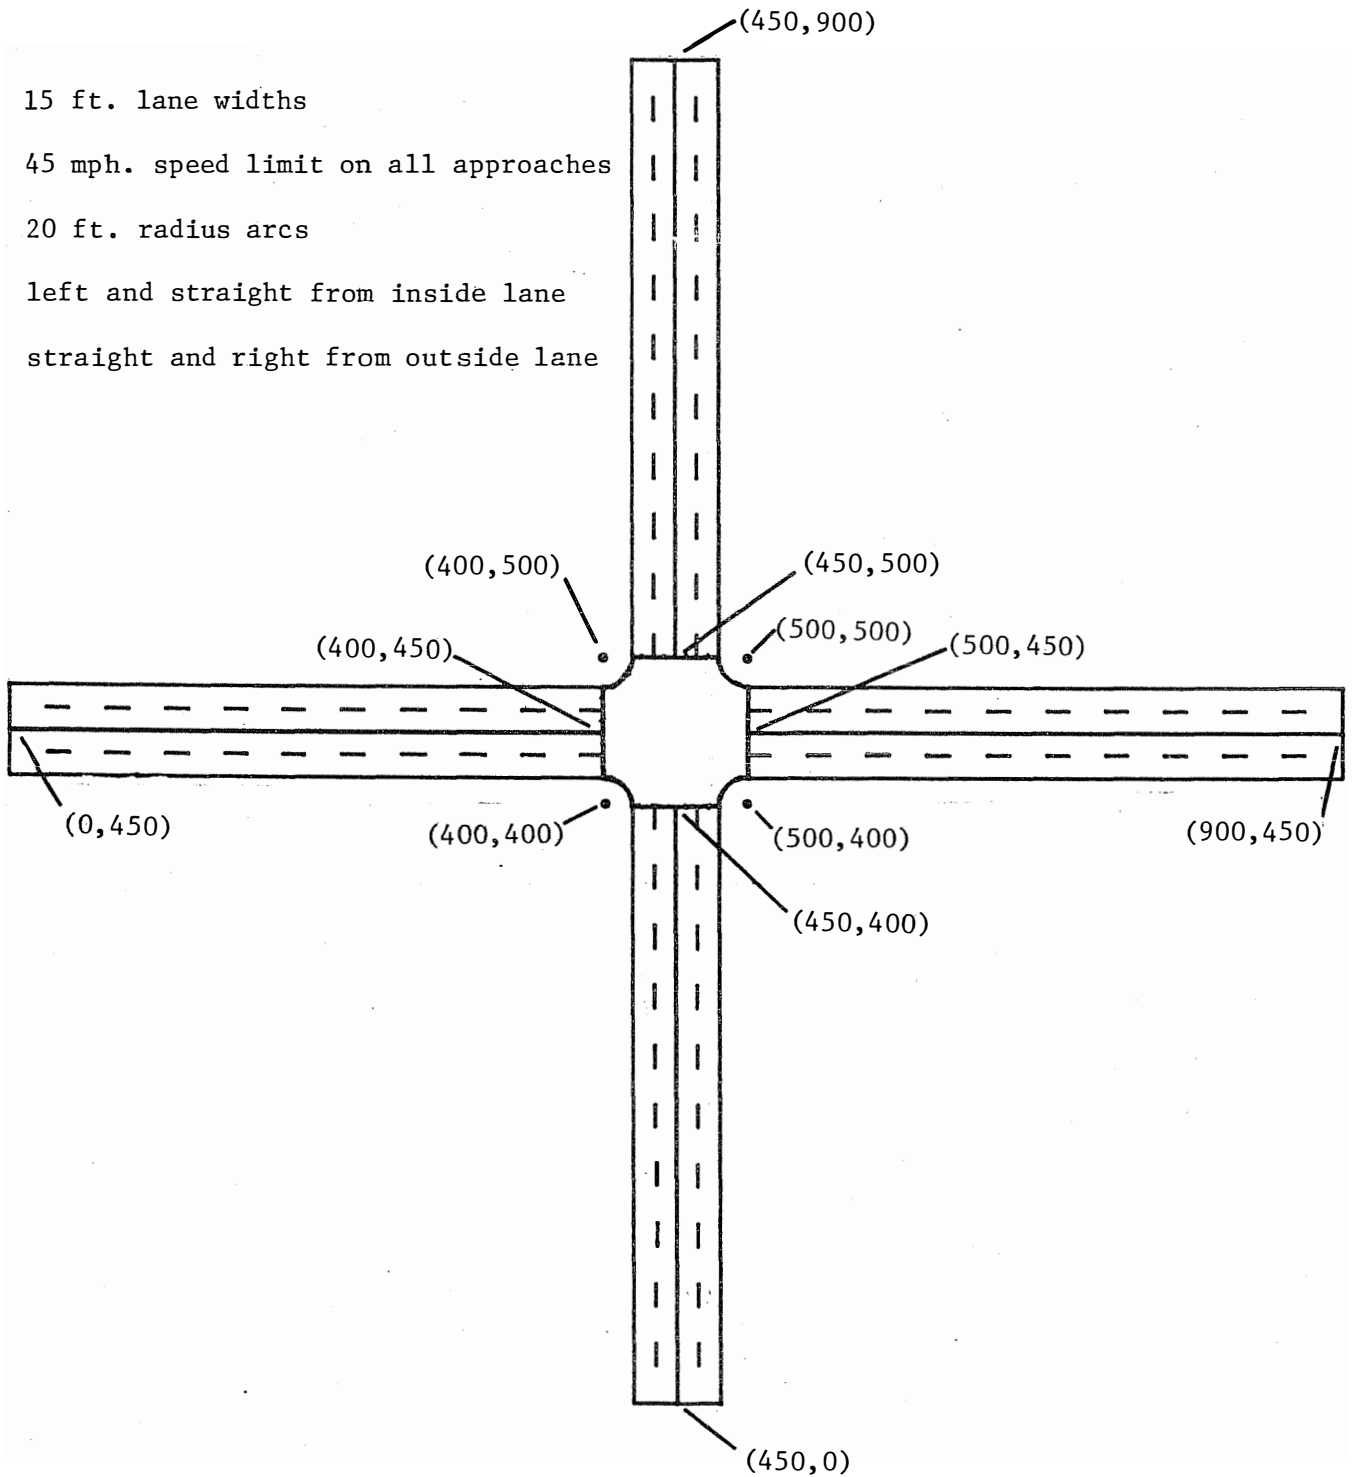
4 LEG INTERSECTION EXAMPLE LAYOUT
